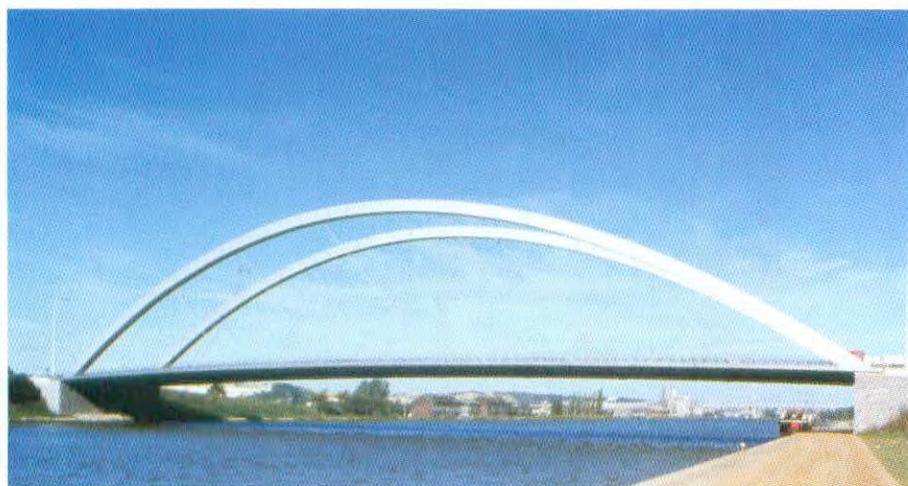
5. Bow-string bridge: Haccourt bridge in Belgium [2]
